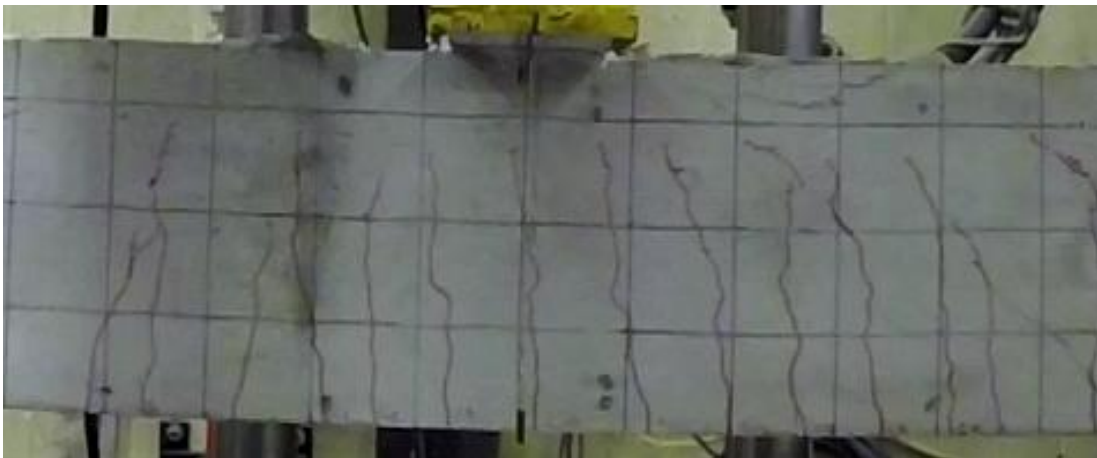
BM 8.5-150: Crack patterns at failure
